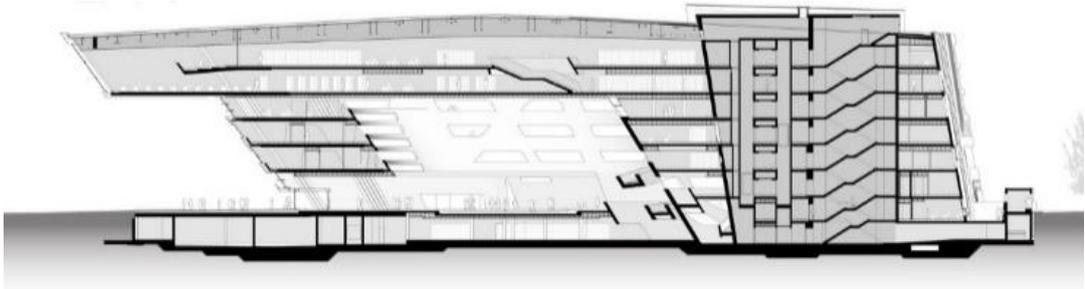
longitudinal section of LLC illustrates the inclined walls, mass cantilever and multistory atrium. Source <http://www.zaha-hadid.com>
